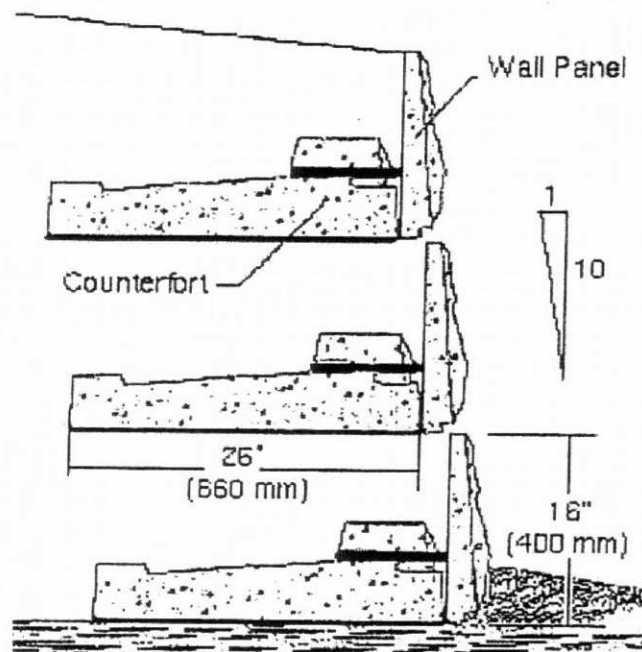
Cross section view illustrating the dimensions of the counterfort units (without soil reinforcement layers).
